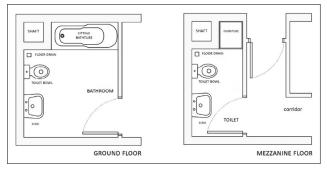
2D Plumbing Plan on CM (hand drawing) practice.
